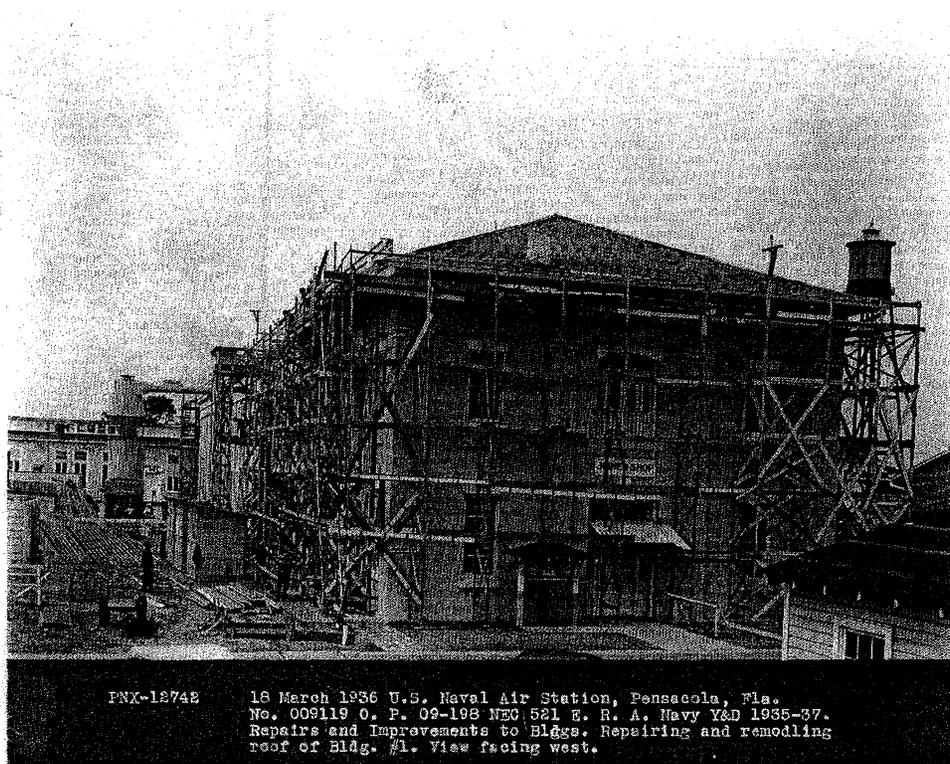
1936 photo showing changes to the parapet and roofline of Building No. 1. (Photo courtesy of Still Pictures Unit, NARA, College Park, Maryland).
